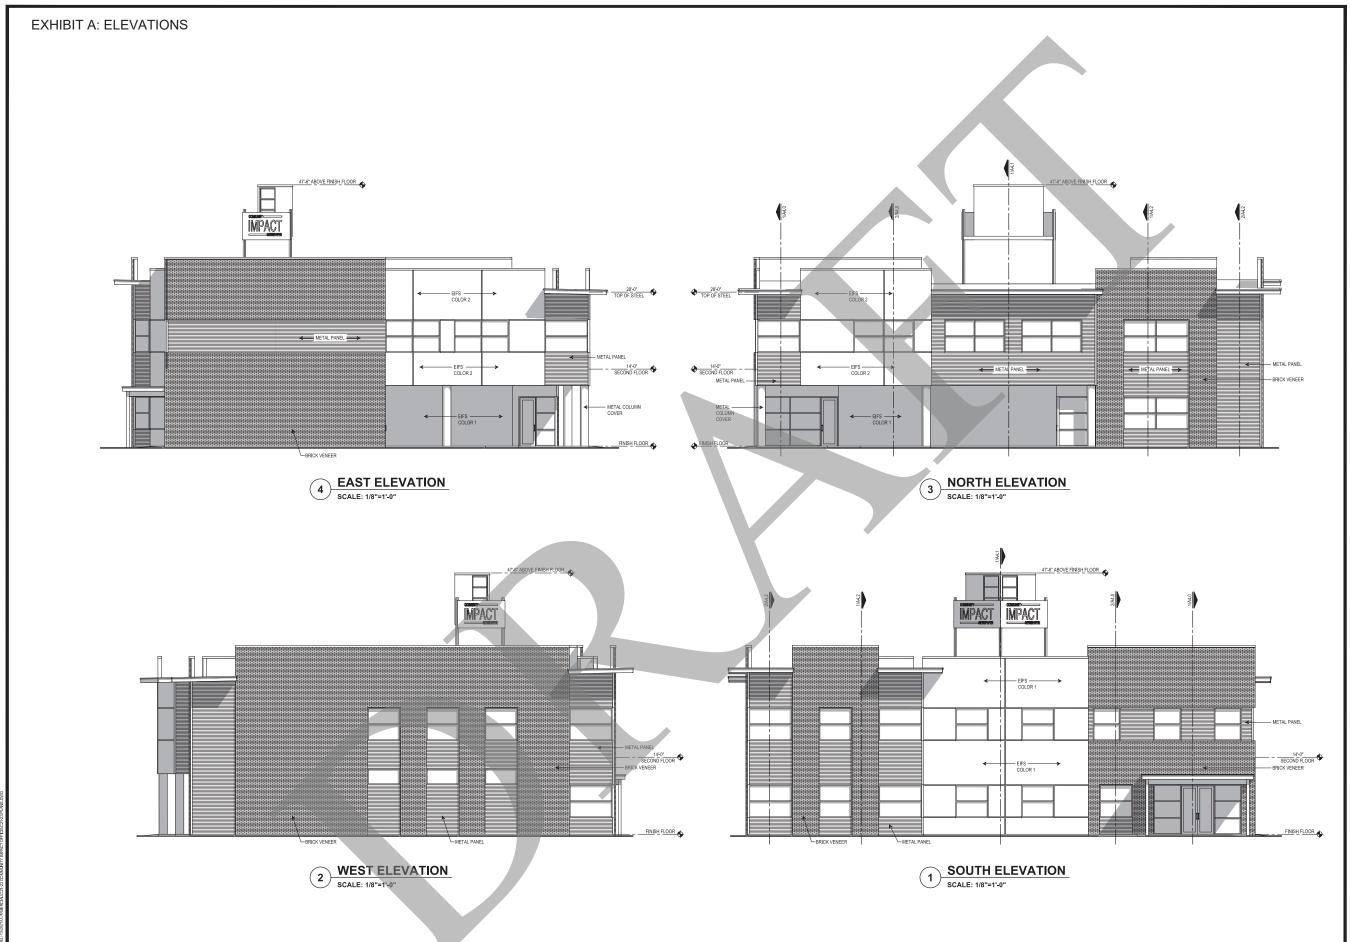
Exhibit A Planning and Zoning Alternative Comprehensive Signage Plan
